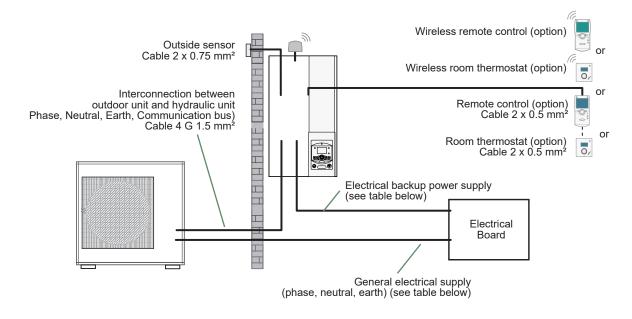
Overall layout of electrical connections for a simple installation (1 heating circuit)
